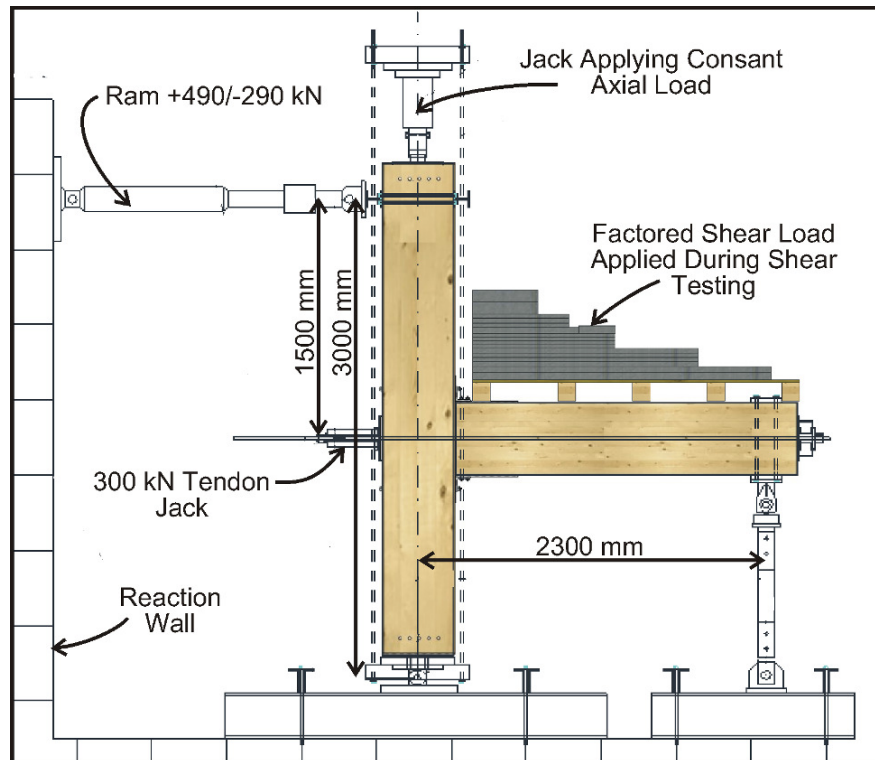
Full scale post-tensioned timber beam-column joint test set-up
